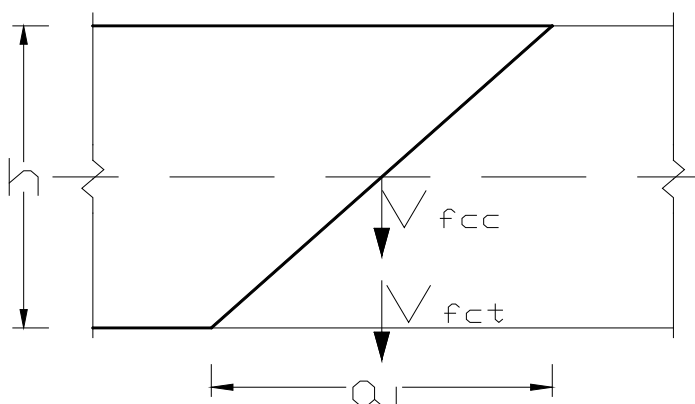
Superposition of shear force in the fiber-reinforced concrete beam without stirrups (SP-52-104-2007)
